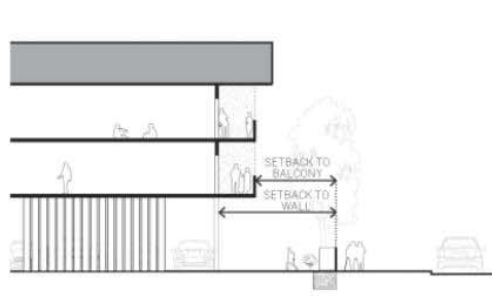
front boundary setback to balcony and wall
